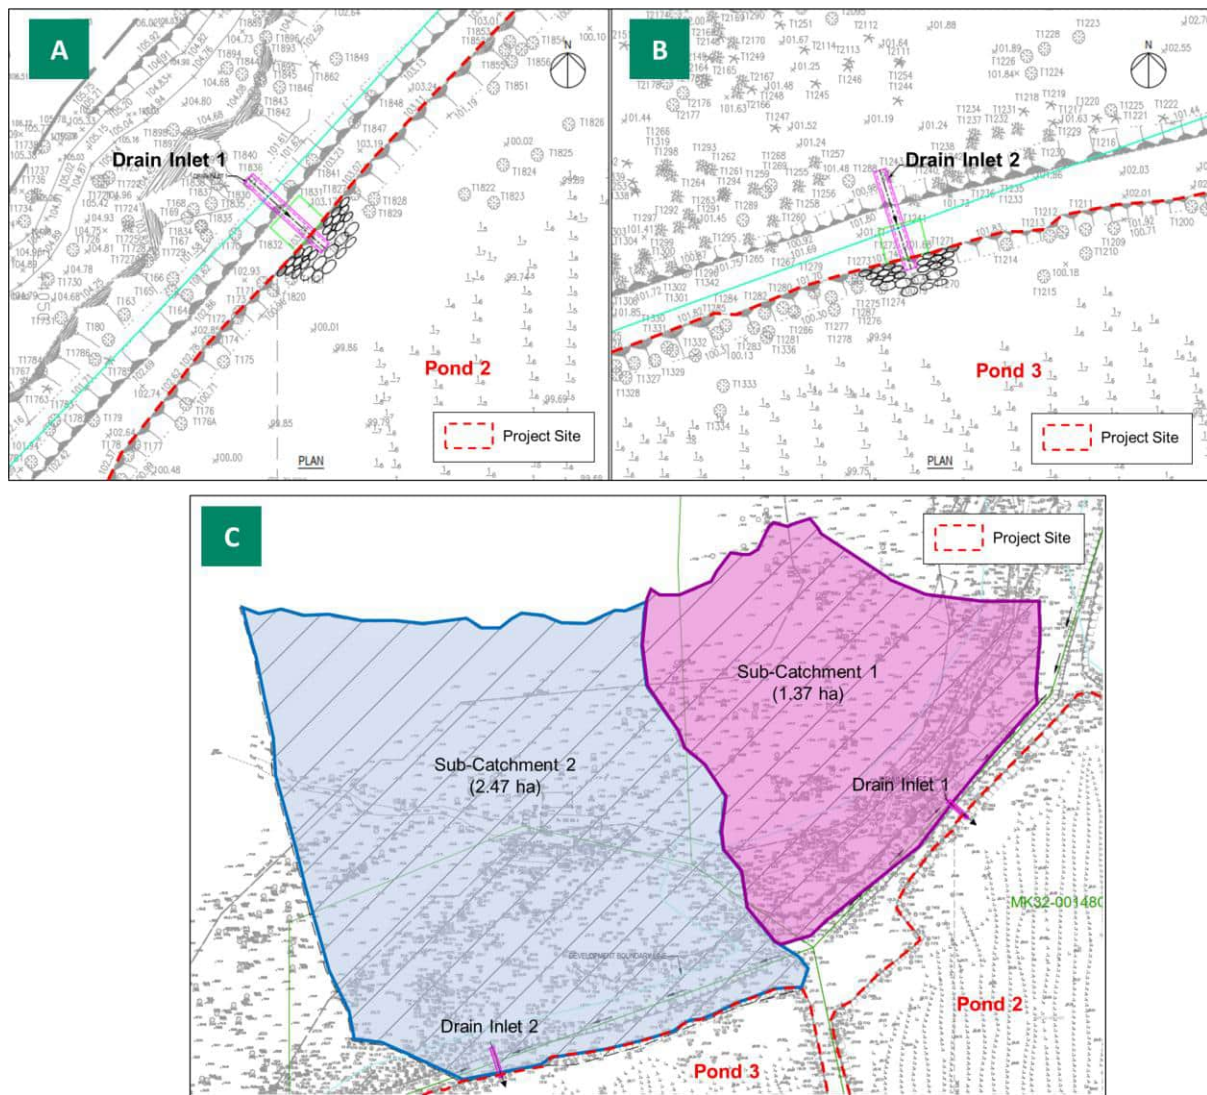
Layout plan of proposed drain inlets: (A) Drain inlet 1 at Pond 2, (B) Drain inlet 2 at Pond 3, (C) Sub-catchment areas of drain inlet 1 and drain inlet 2.
